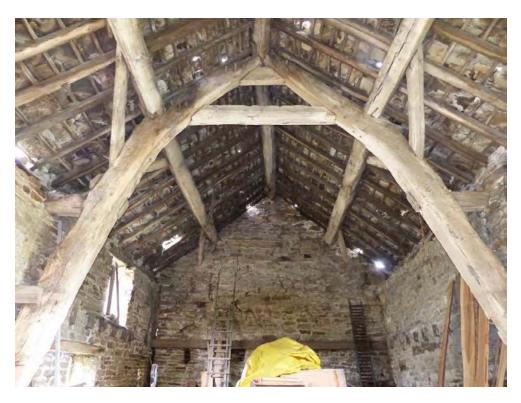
Bay 5 showing remains of floor joists in east, west and south walls
